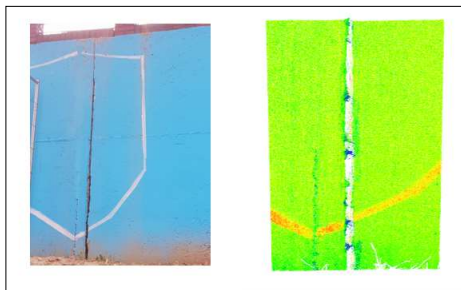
The photo of two concrete slabs and a TLS point cloud of the measured area.
